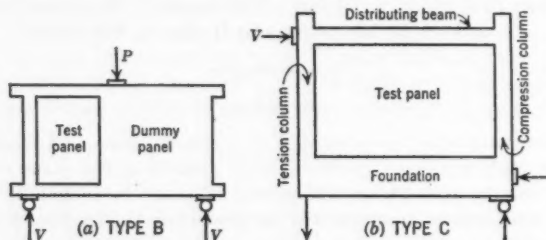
TYPE SPECIMENS B AND C AND METHODS OF LOADING
